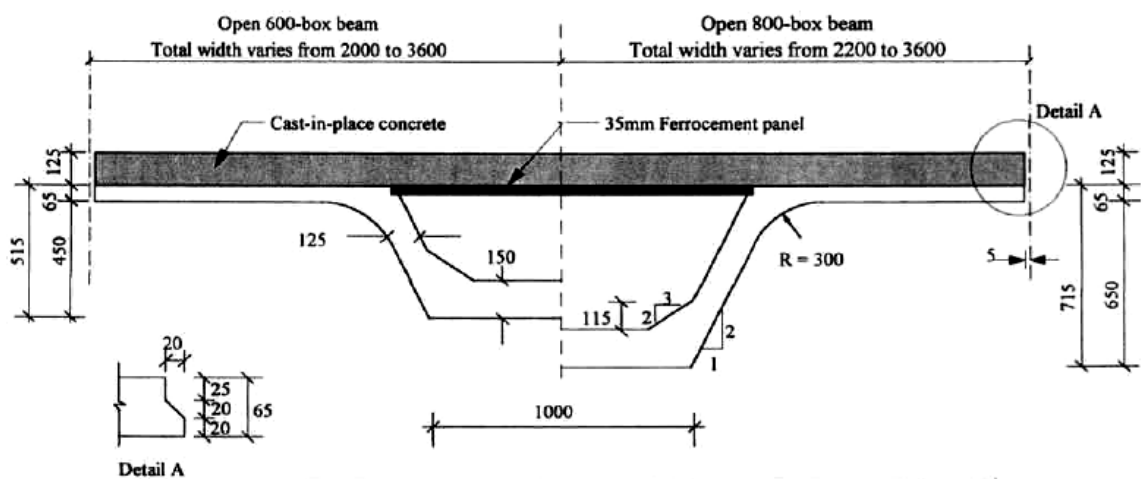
Cross section of the open trapezoidal box beam (dimensions are in mm) (Badie et al., 1999)
